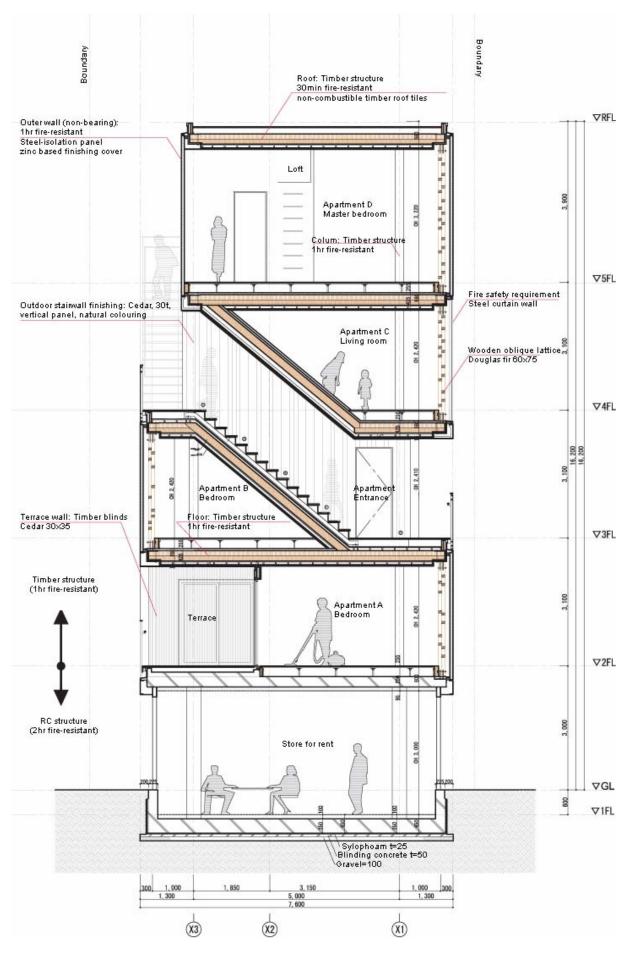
c - Detailed section; Dimensions in [mm]
